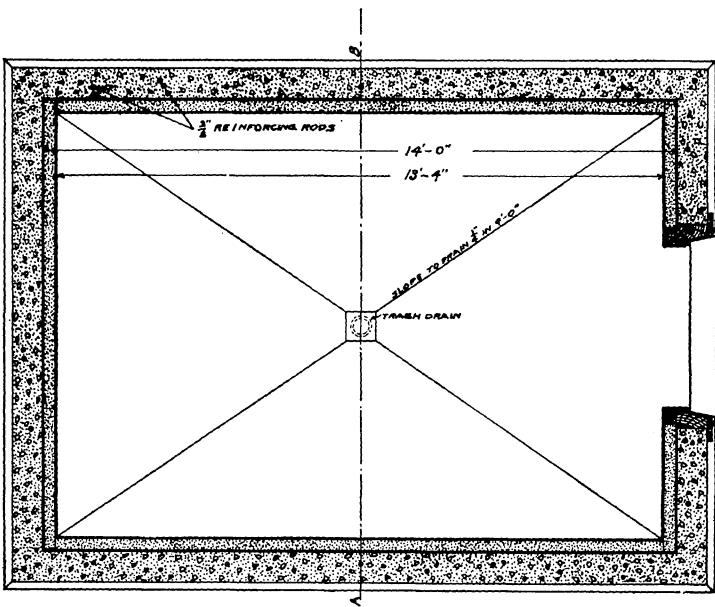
Small concrete ice house, (Ground plan of fig. 10.)
